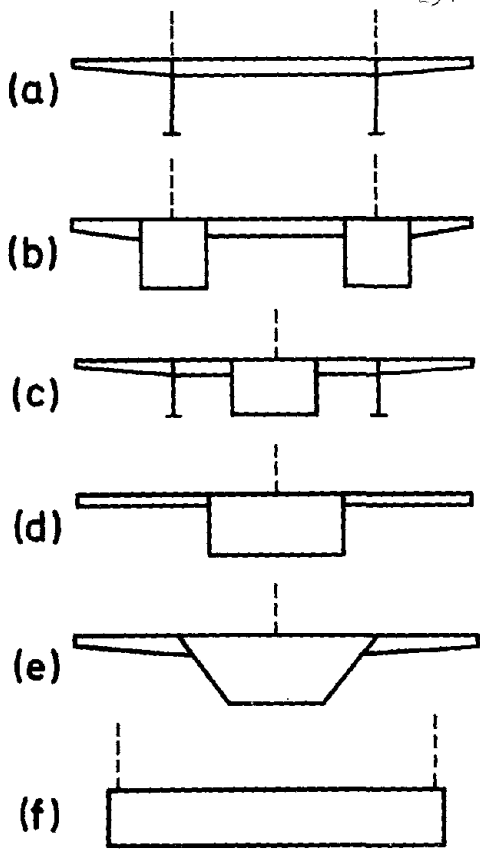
Basic Cross-Section of Cable-Stayed Girder Bridges
